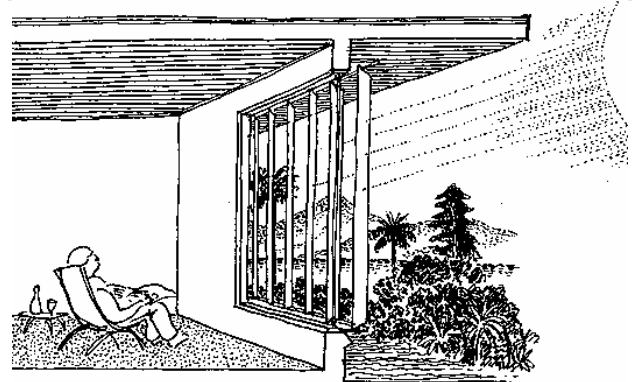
Vertical louvres can be used to shade from low angle sun while retaining views.
